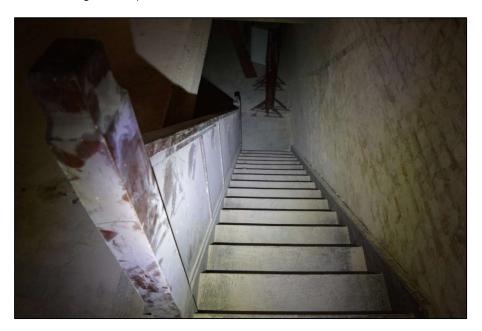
Stair down from modern first floor extension to ground floor (CPAT 4853-0043)
